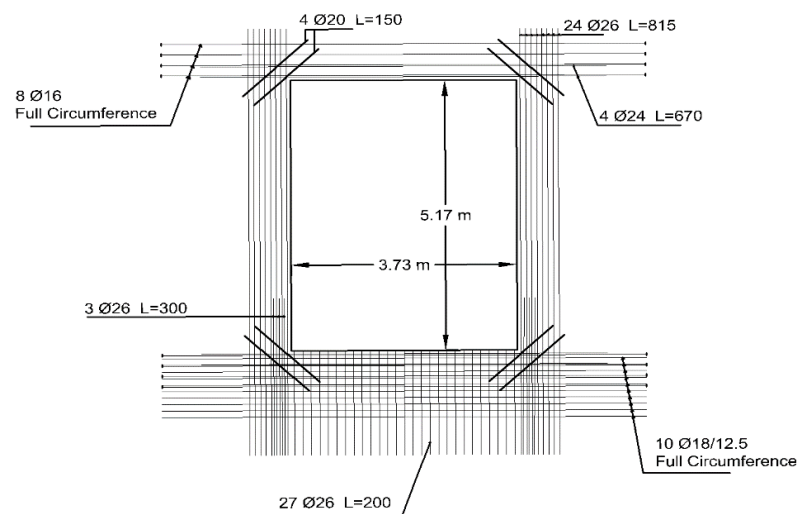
Opening reinforcement details of the chimney 25F-5.
